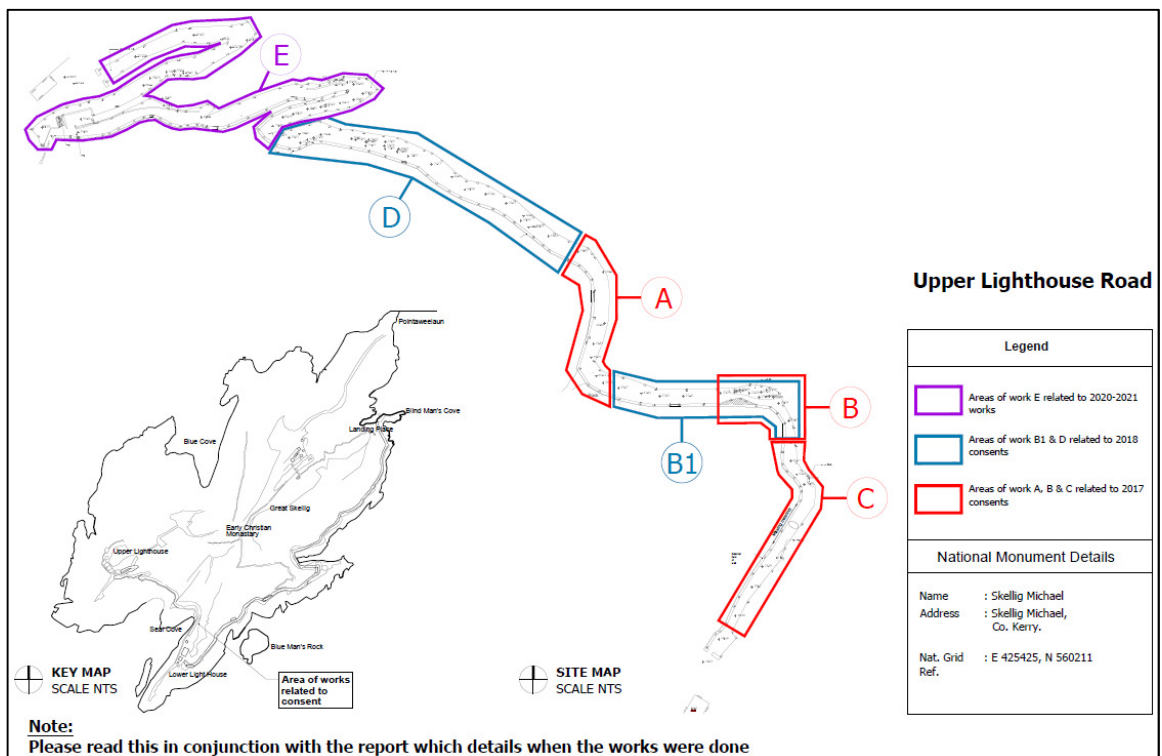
Works to Upper Lighthouse Road 2017 - 2021
